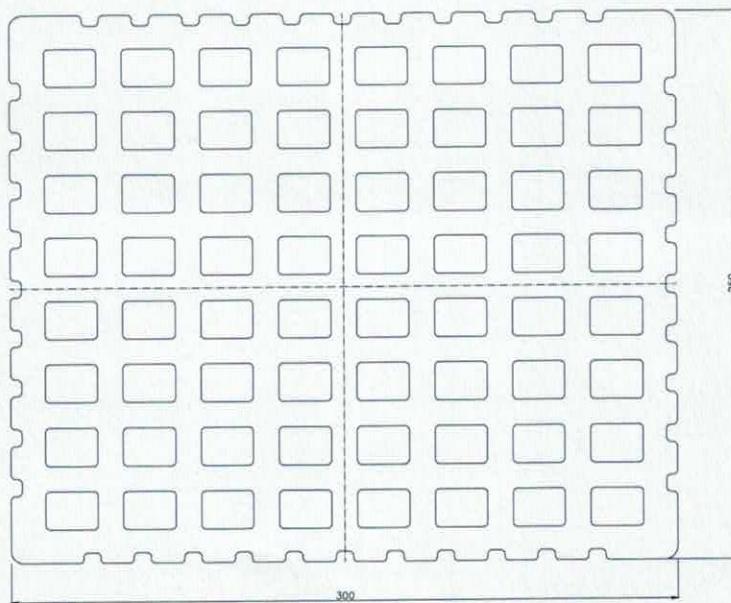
Schematic drawing of the block THERMOton 25/30 AKU
